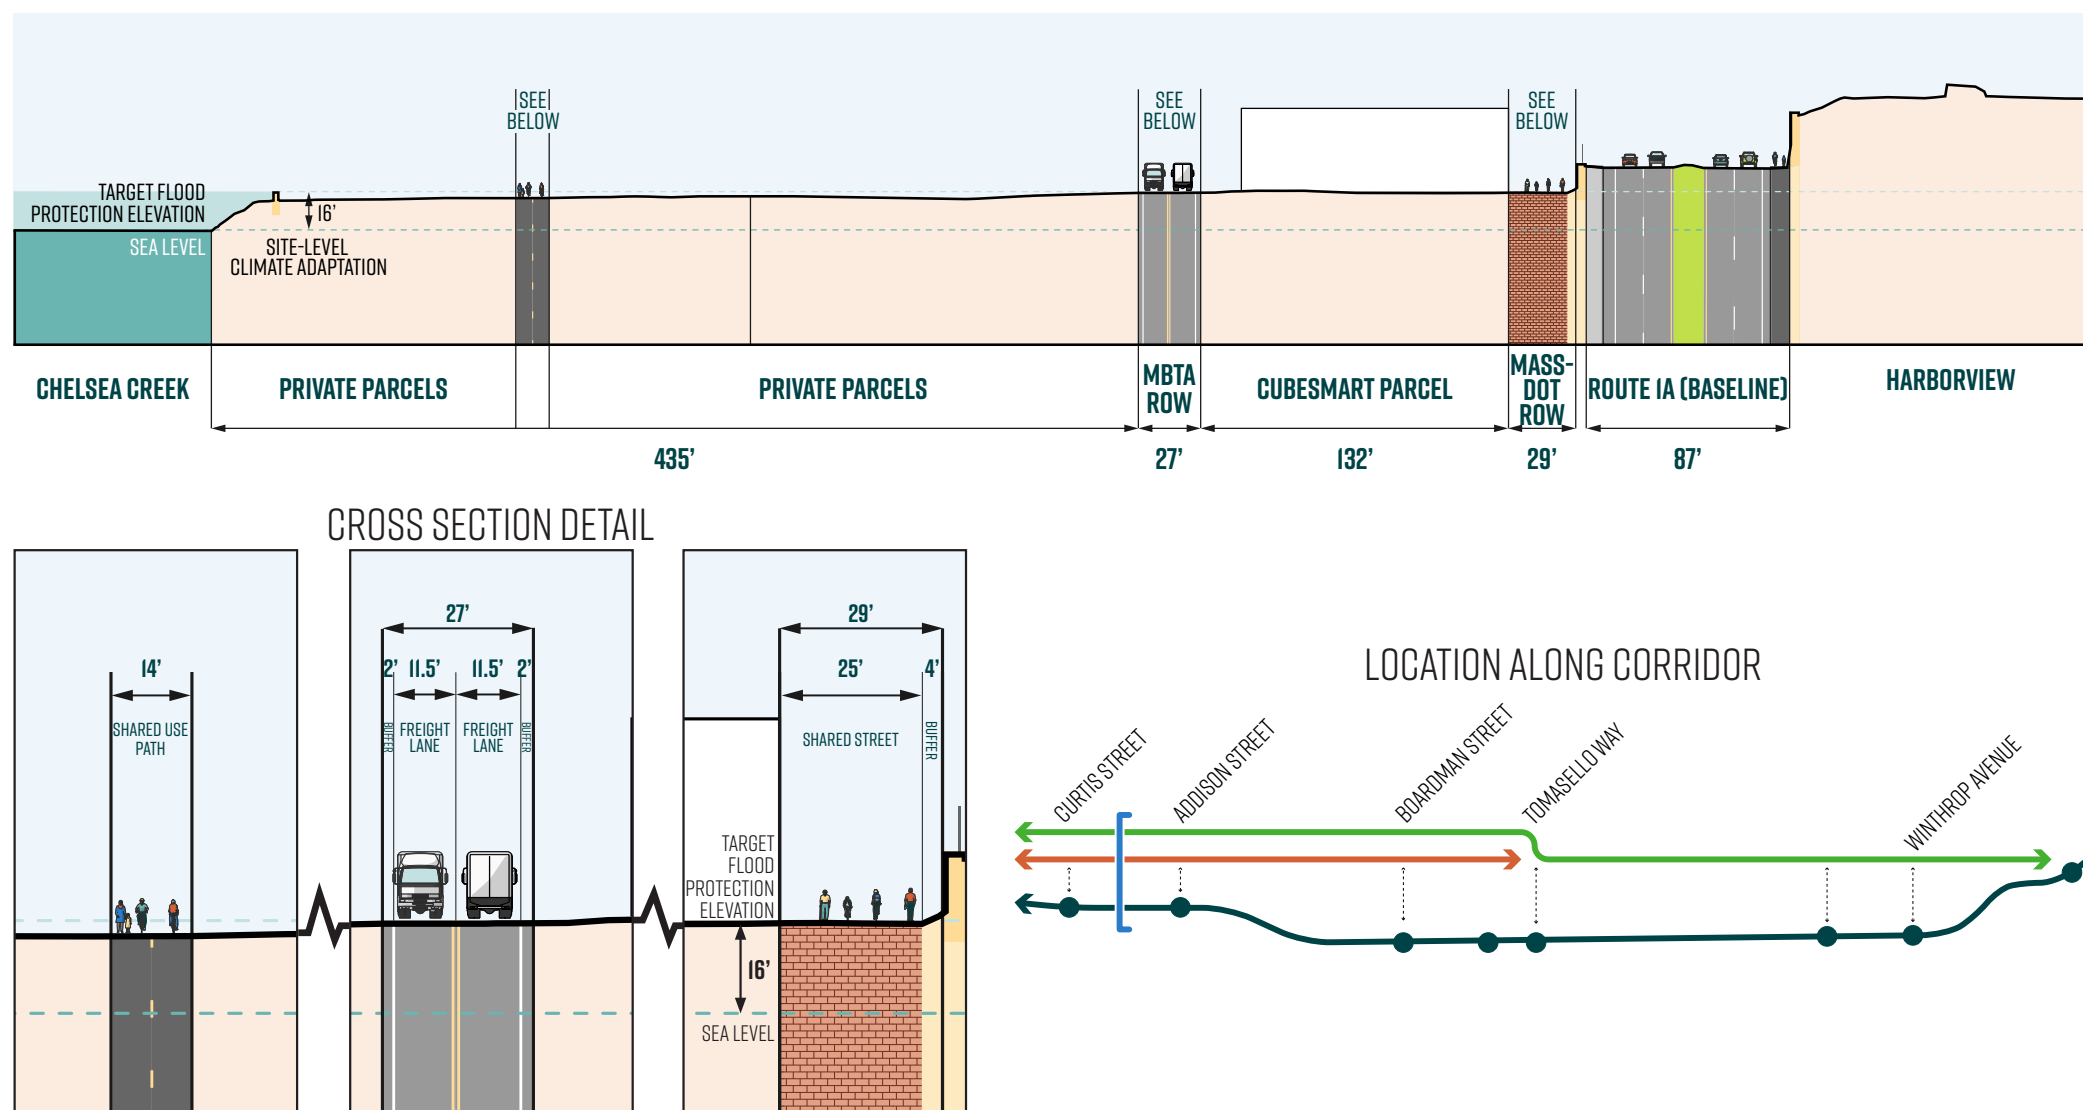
Bypass Road with Shared Use Path (SUP) - Curtis Street to Addison Street
